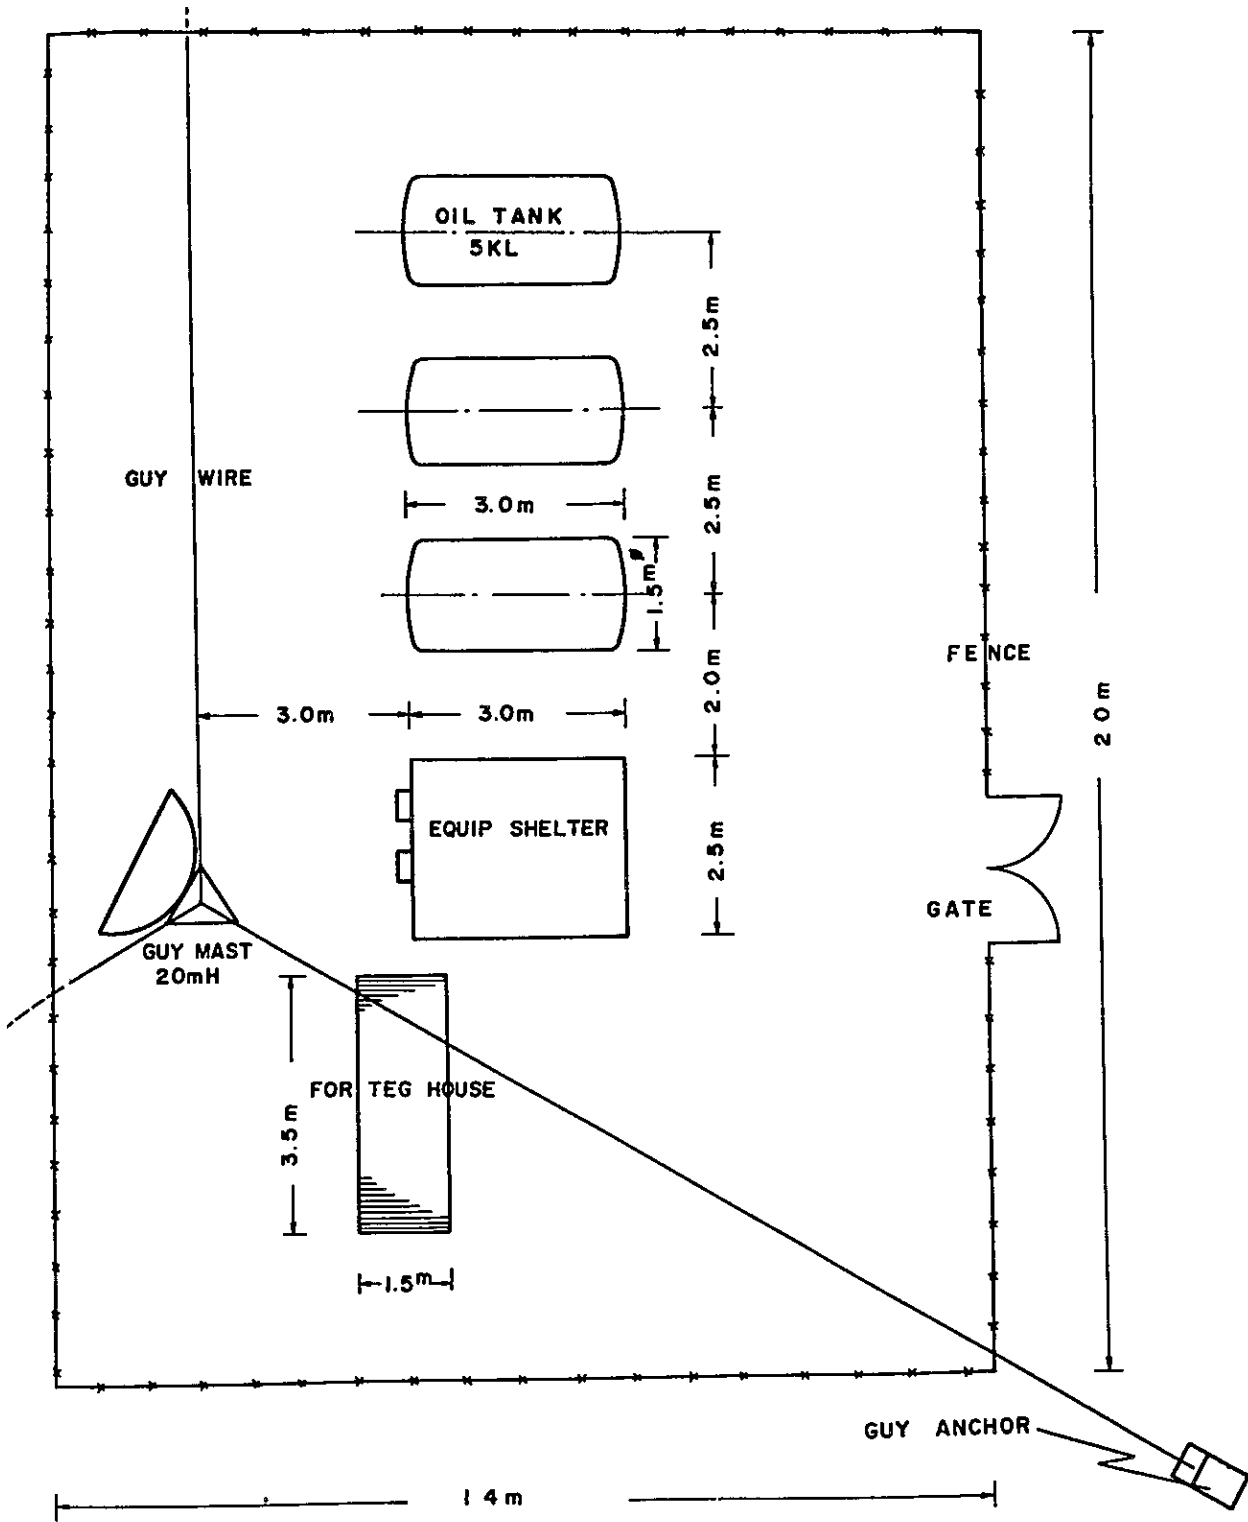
Typical Site Layout for UHF Repeater (1/2)
